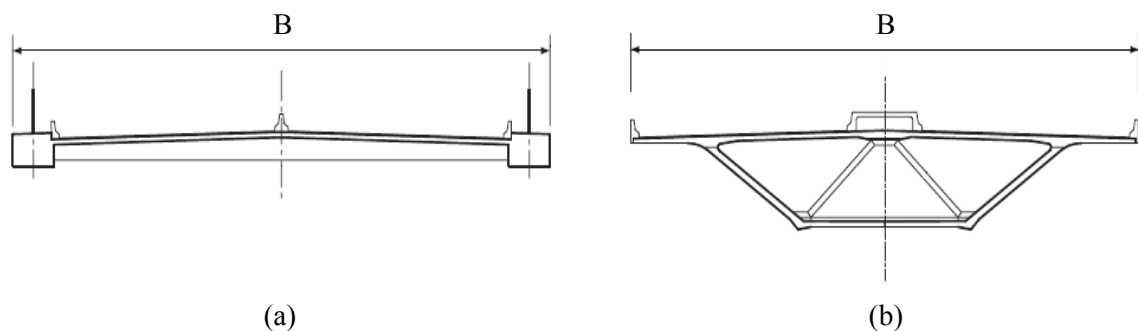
Typical deck cross sections for (a) lateral cable configuration and (b) central cable configuration (*adapted from Parke and Hewson (2008)*).
